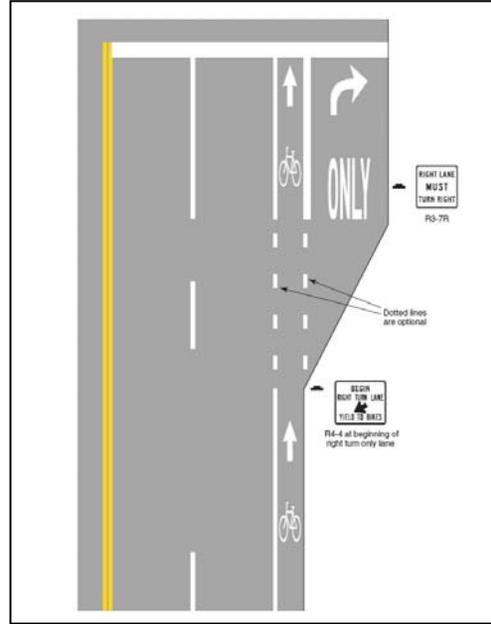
Example of Pavement Markings for Bicycle Lanes on a Two-Way Street
